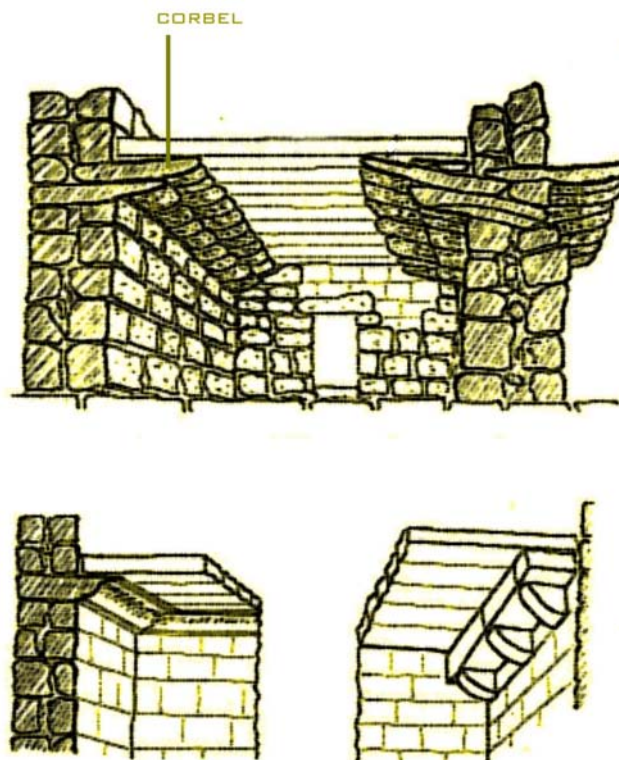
The use of Cantilever Ceiling and roof support at Umm El Jimal
